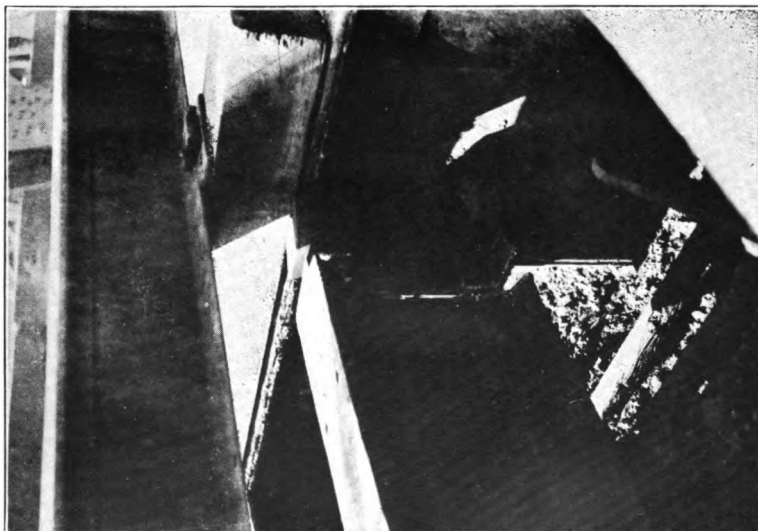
Ashland Avenue Bridge—Stringer under track cut away from the floor beam by means of a torch.
